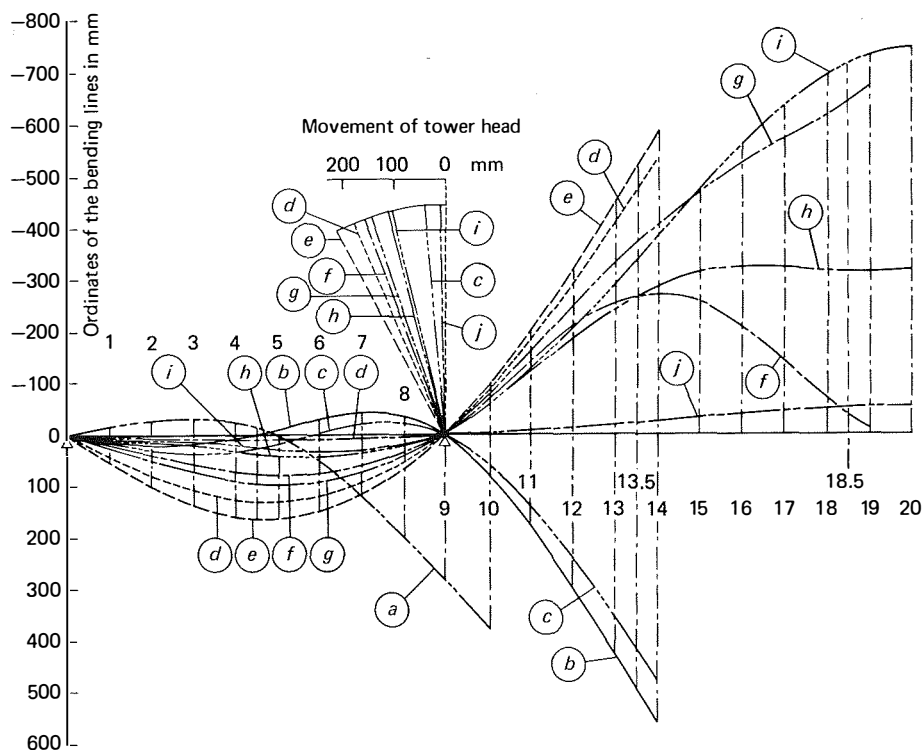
Strömsund Bridge, erection sequence: (a) erection up to the first temporary support, (b) erection up to the second temporary support, (c) erection up to the tower pier, (d) erection of the tower and brace against the stiffening girder, (e) erection past point 13.5, the connection of the inside stay 3, (f) derrick moved back to the tower pier. Girder jacked at tower. Erection of the inside stays 2 and 3, (g) inside stays 2 and 3 tensioned, (h) erection past point 18.5, the connection of the outside stay 4, (i) derrick moved back to the tower pier. Stay 4 installation, (j) stay 4 initially tensioned, (k) closure and final tensioning of stay 4, (l) completion of superstructure, concrete slab, and so forth, and final position of the bridge geometry. (Courtesy of Der Stahlbau, from reference 11.)
